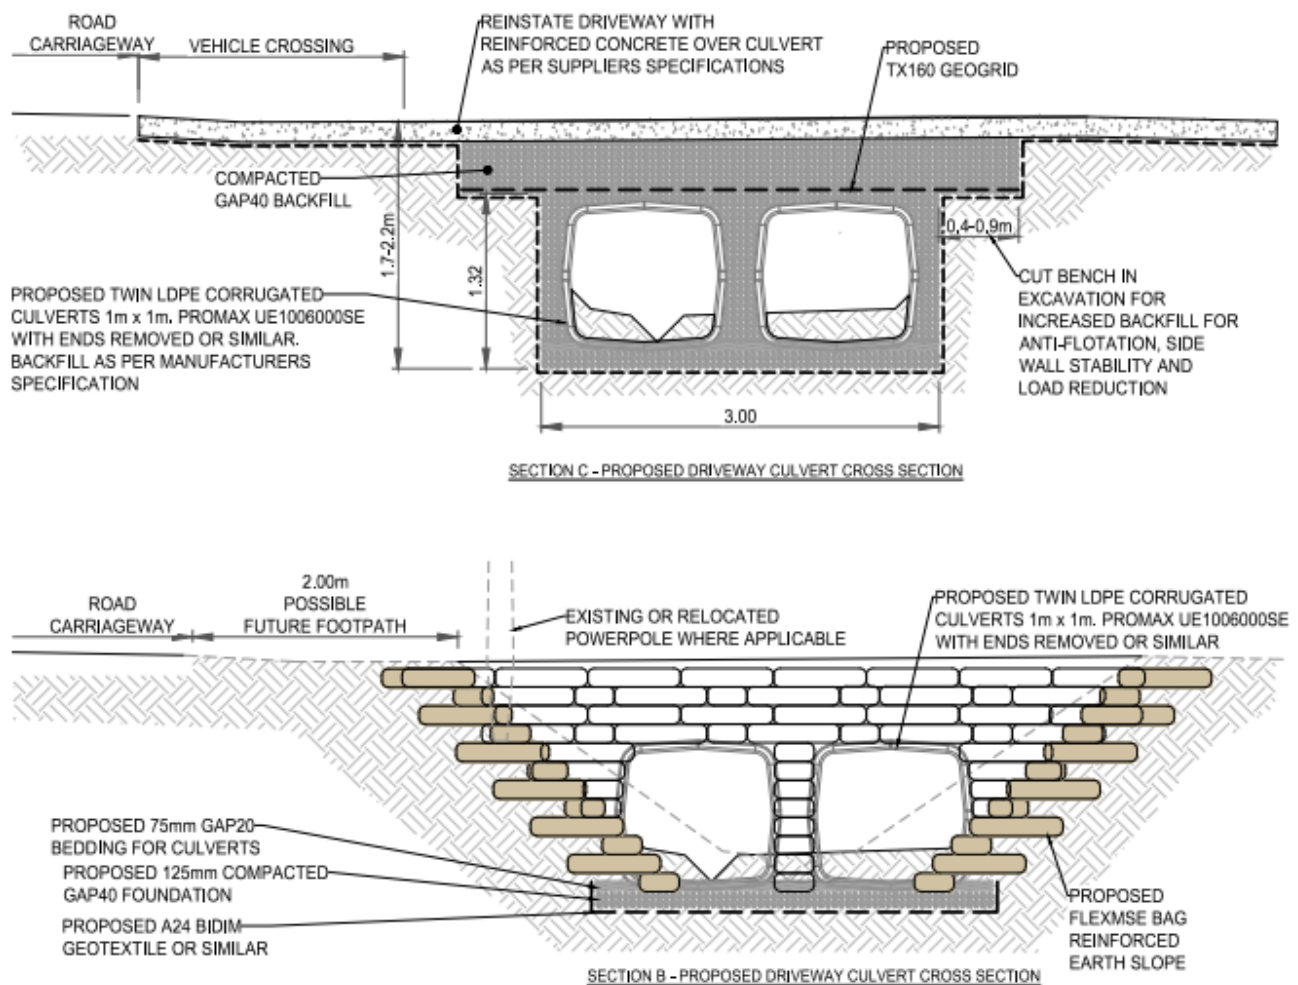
Cross-sections of proposed driveway culverts (Drawing N.007799.60 - Appendix B).
